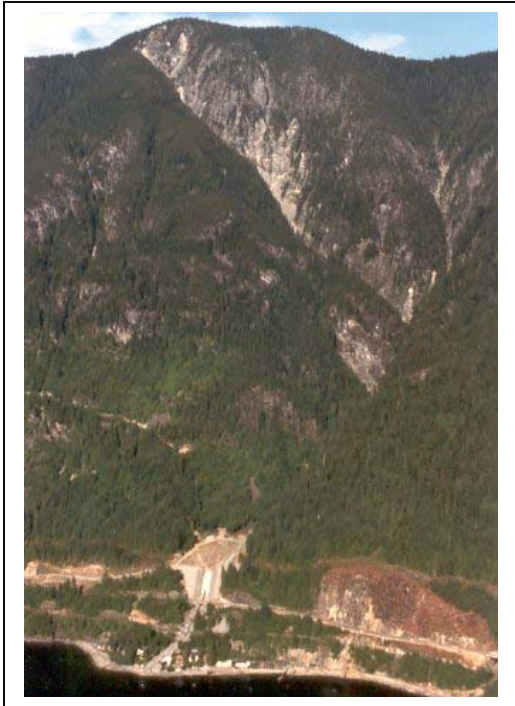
The barrier was built as a zoned earthfill dam, capable of retaining water to full height, should the drainage openings be completely plugged. A reinforced concrete decant structure on the upstream face is intended to retain debris, while draining water through two precast concrete outlet conduits. A concrete spillway was constructed on the downstream face of the barrier, to protect the earthfill from erosion in the event of overtopping.
